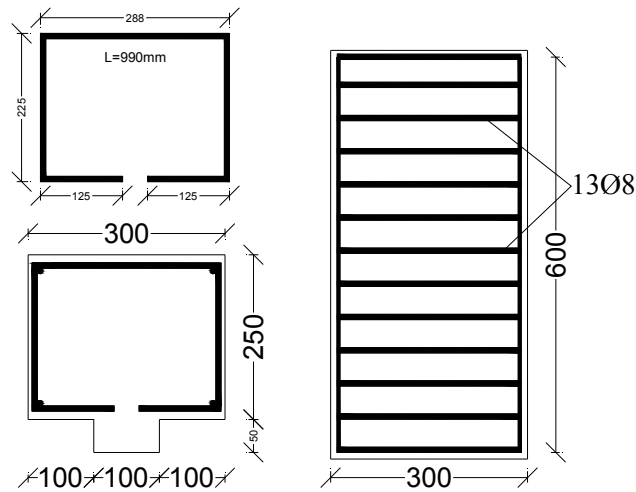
Reinforcement layout and geometry of specimen 5 (Specimen code 3.5 - loading at 1/4 of the length).
